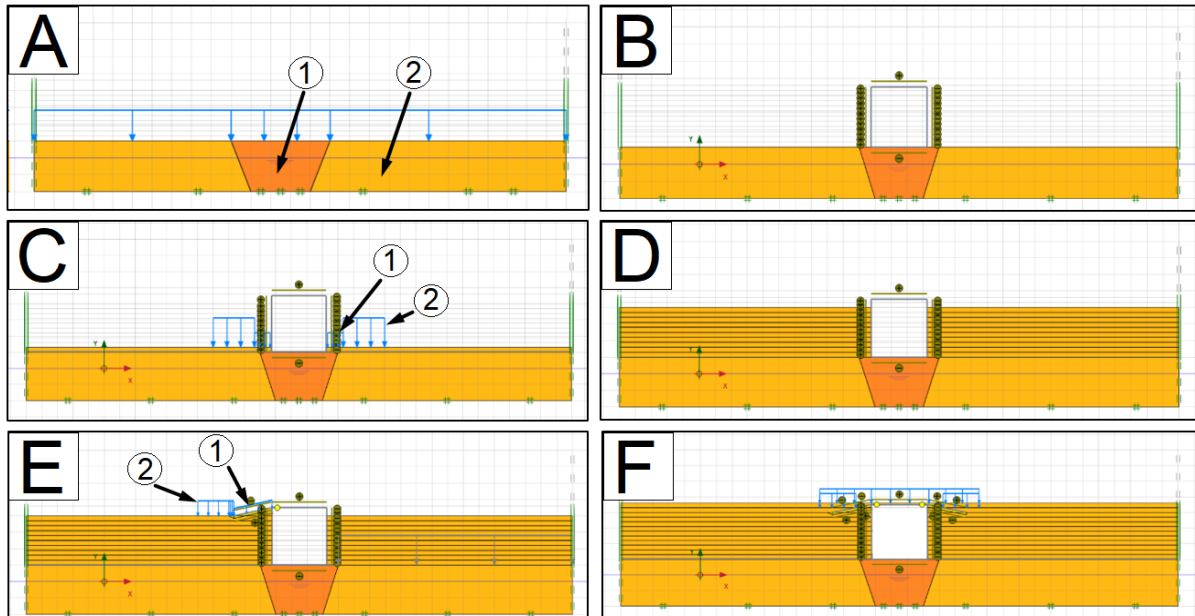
Summary: The methodology showing all construction steps for a rigid culvert built with a transition slab, showing A) preparation of the foundation, B) construction of the culvert, C) backfilling and D) when reaching the level of the transition slab, E) constructing the layers below the slab and F) compacting the material above the culvert
